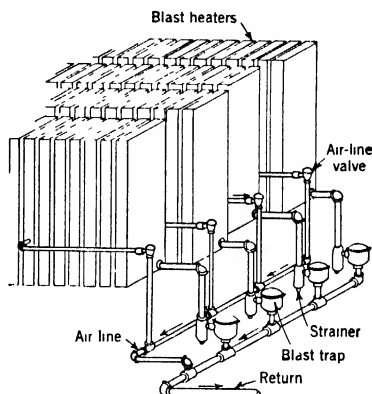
TYPICAL CONNECTIONS TO CENTRAL FAN SYSTEM HEATING UNITS EXCEEDING 12 SECTIONS
